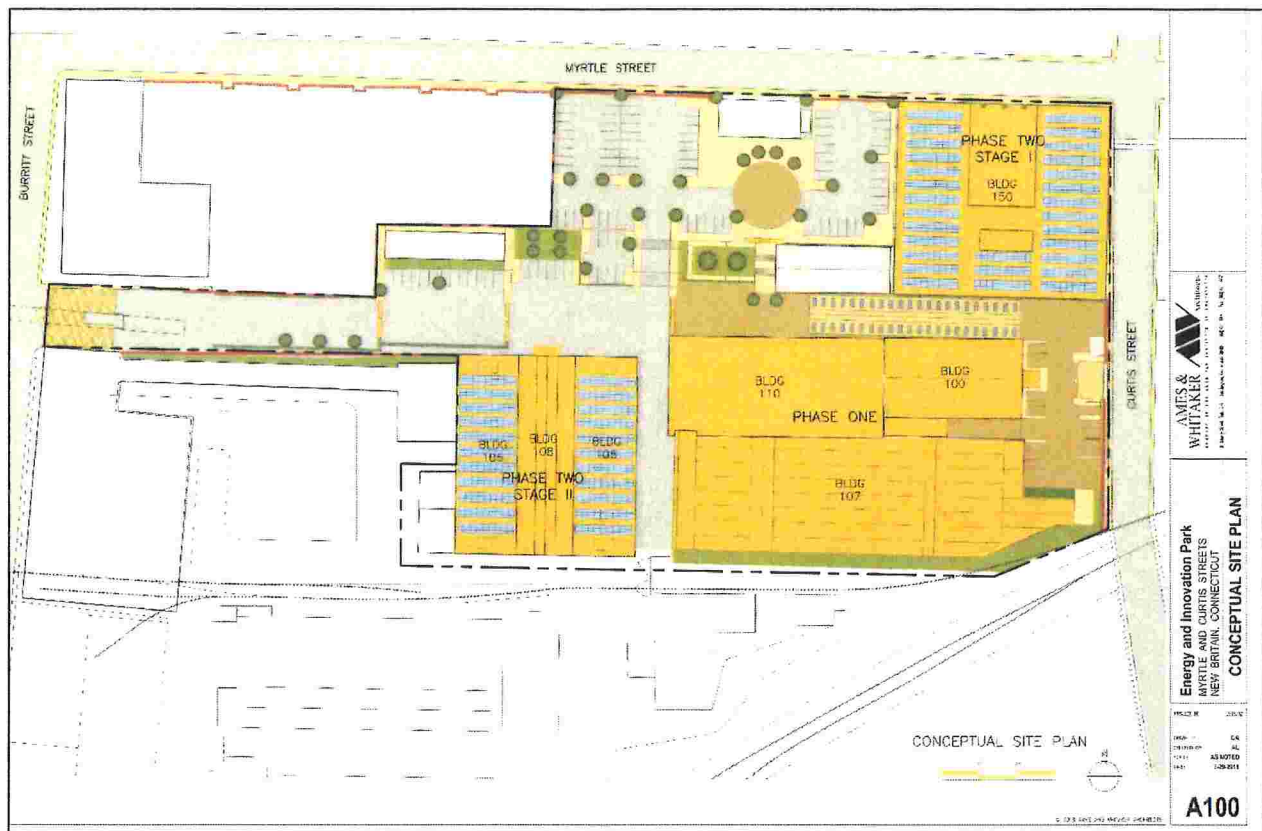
Conceptual Site Plan. Building 107 outlined in red.
